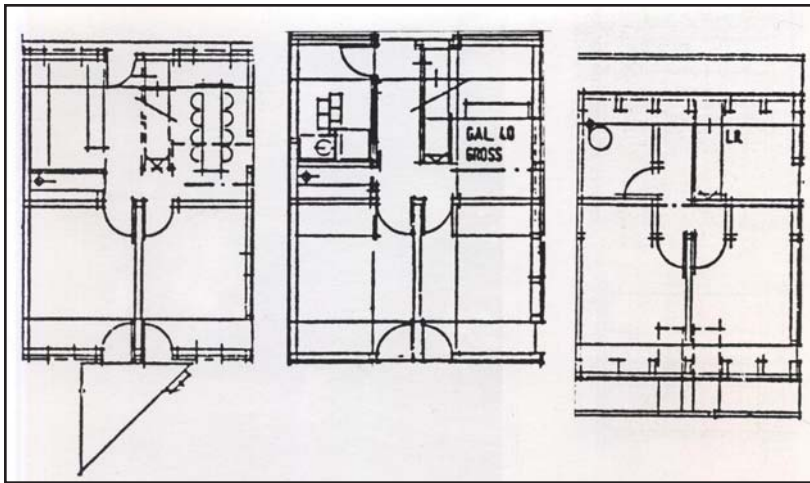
Plans, left to right: 3rd floor, 2nd floor, ground floor.
